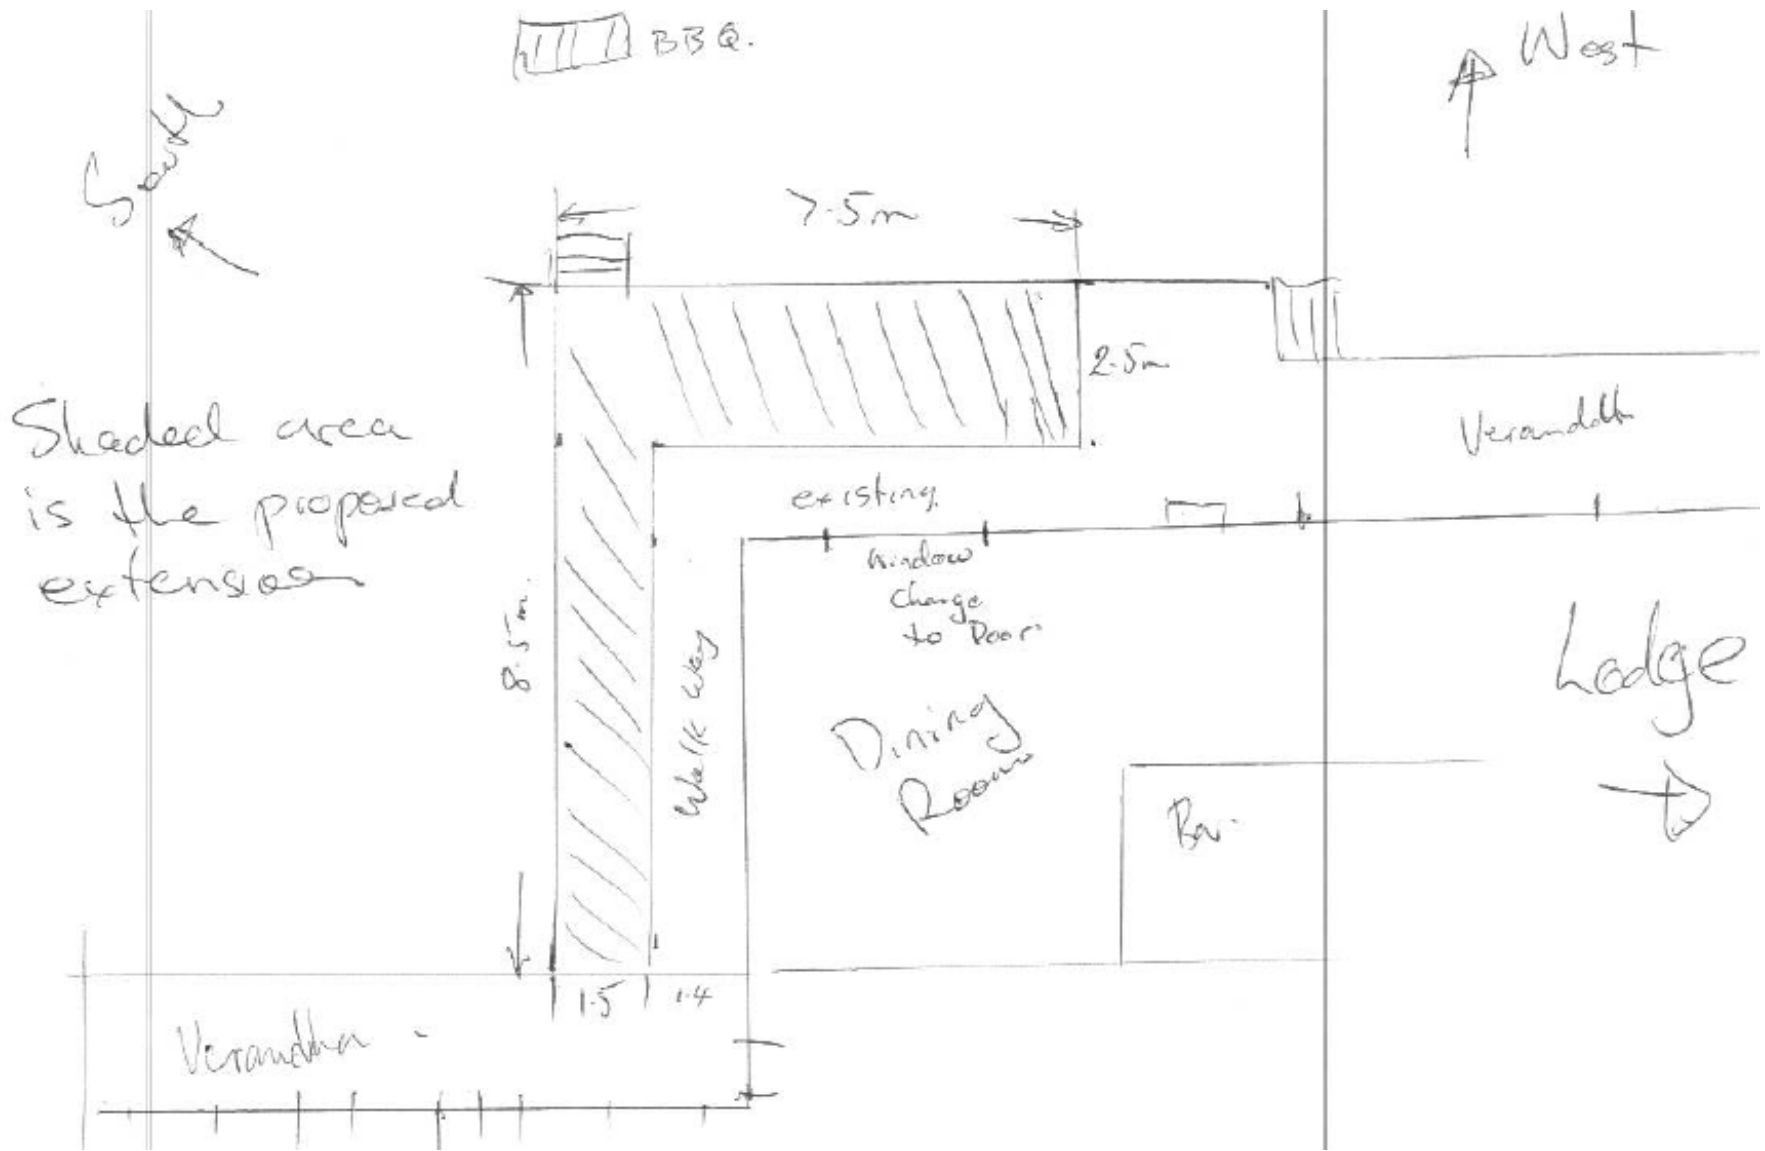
Site Plan submitted by applicant – Deck extensions to restaurant and alterations of window to door.
